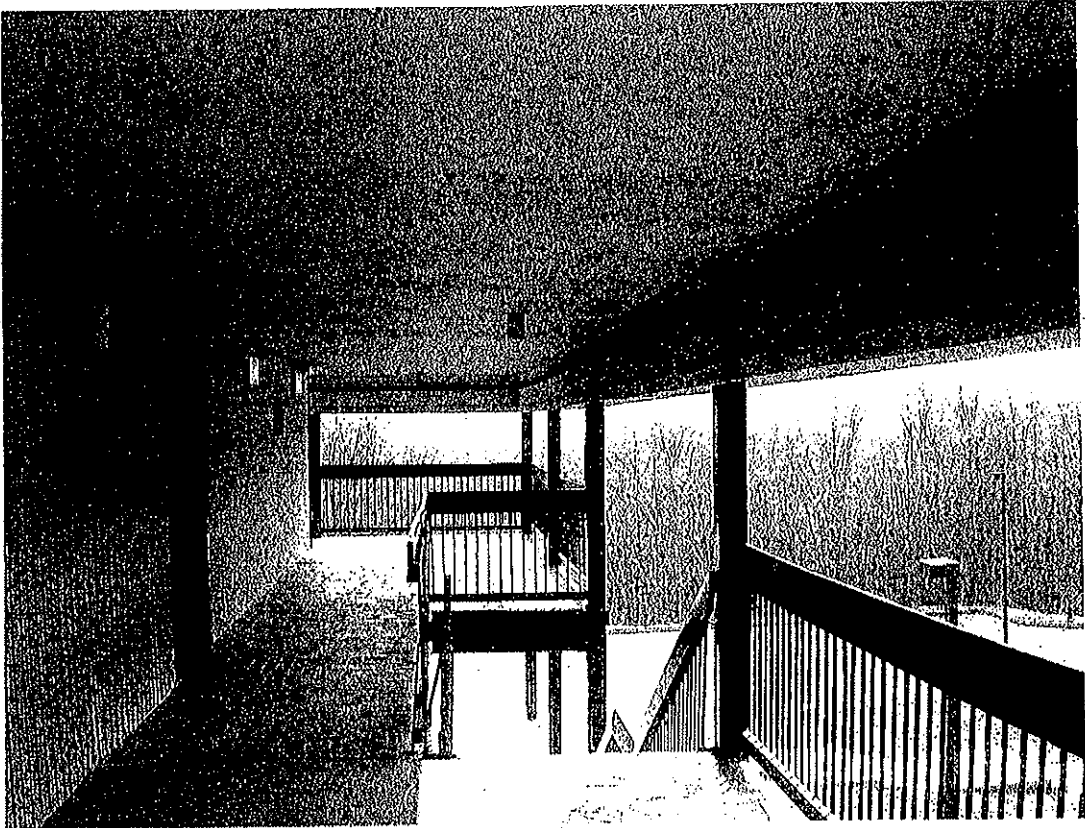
Paint Peeling from Soffit of Roof over Balcony
